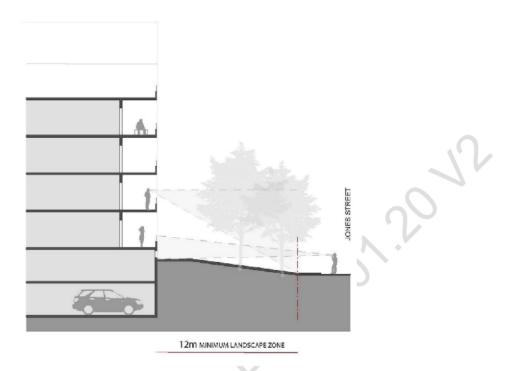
Indicative section at precinct eastern boundary, adjoining Jones Street.
